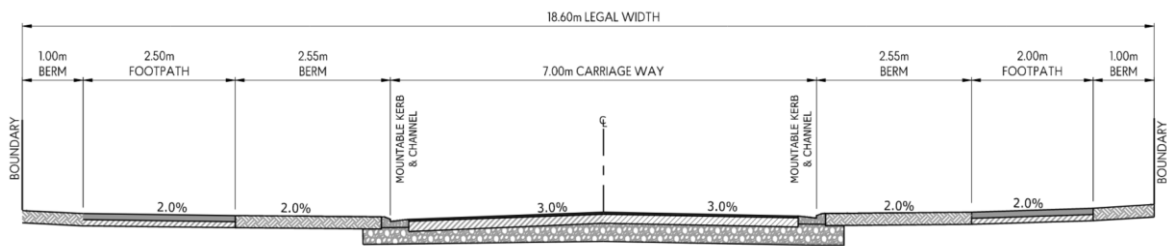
Typical Cross-Section (D) Collector - 18.6m with Berm
